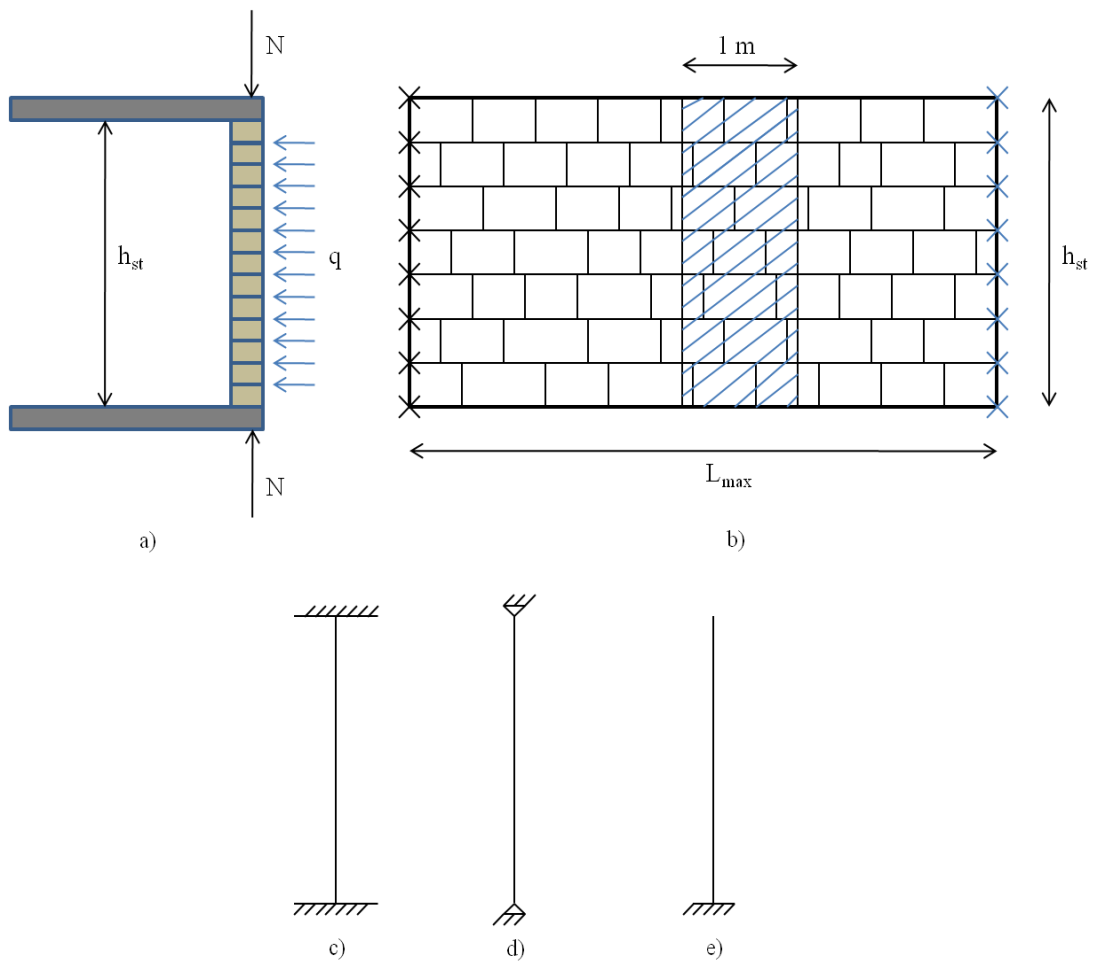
6. a) Out-of-plane loaded wall, b) one way spanning strip assumption, c) fixed boundary condition, d) hinge boundary condition (simple beam), e) cantilever boundary condition
